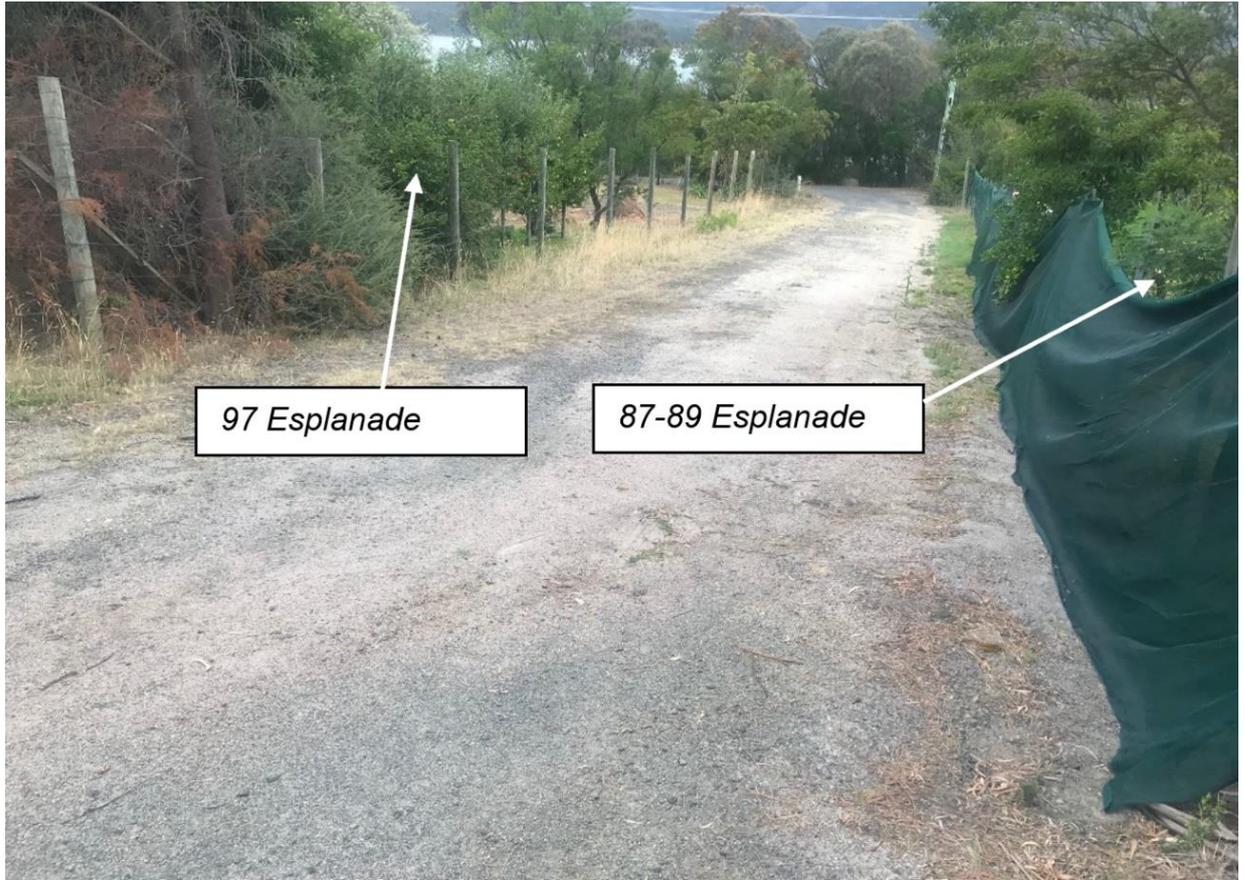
Looking south – existing access ways for 91 and 93 Esplanade
